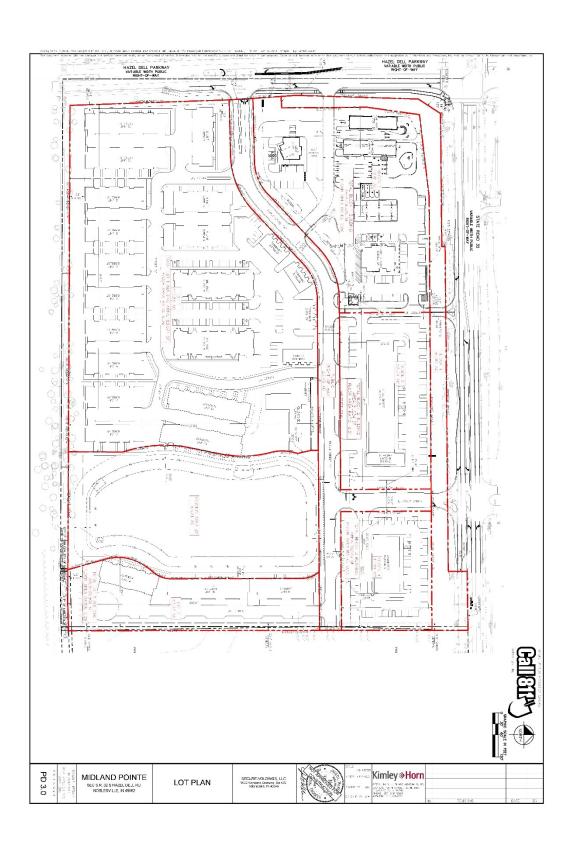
# EXHIBIT D PRELIMINARY DEVELOPMENT PLAN
